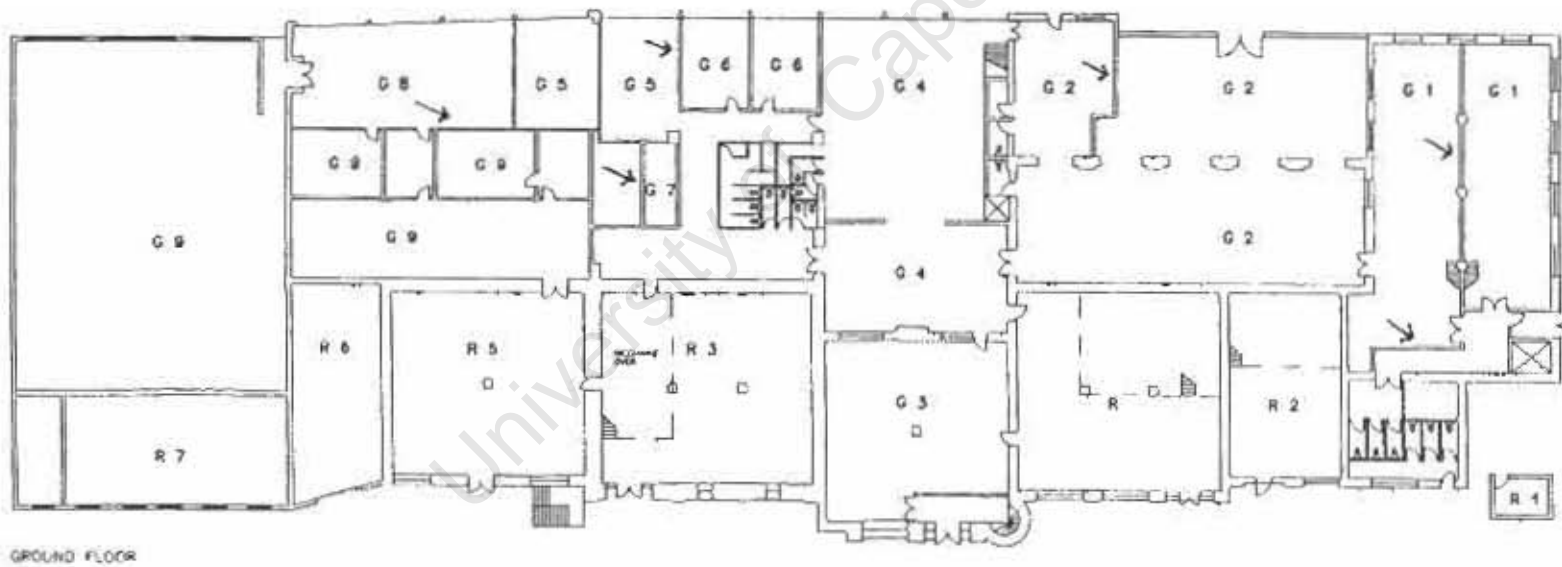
/9: Ground floor of brewery building (1999), showing hardly any subdivisions (Source: Willem Otten)
